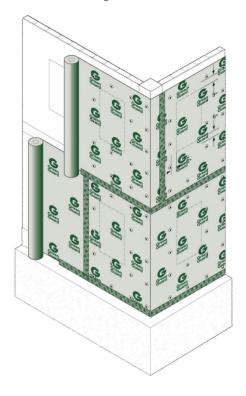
Kingspan GreenGuard® Building Wrap Installation
